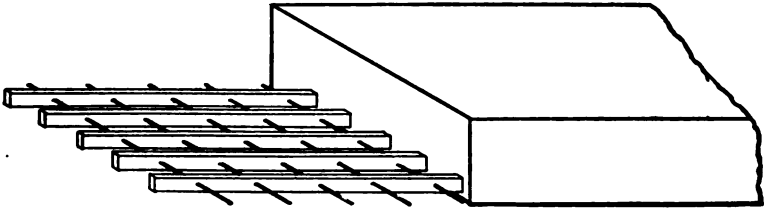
Slab with Hyatt Bar Reinforcement.
